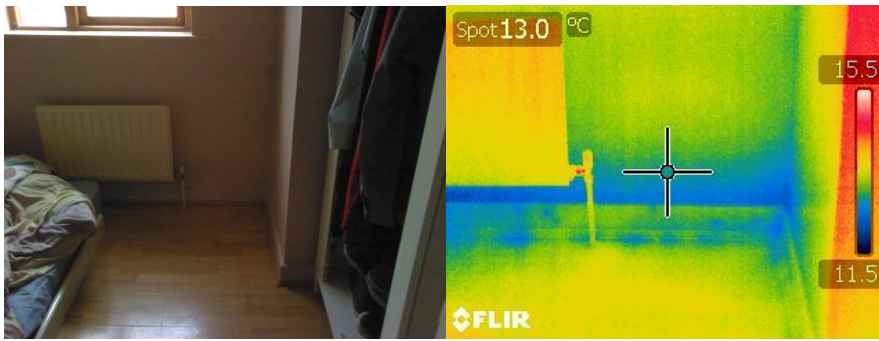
The thermal bridging along the skirting boards of a house constructed in 2000
